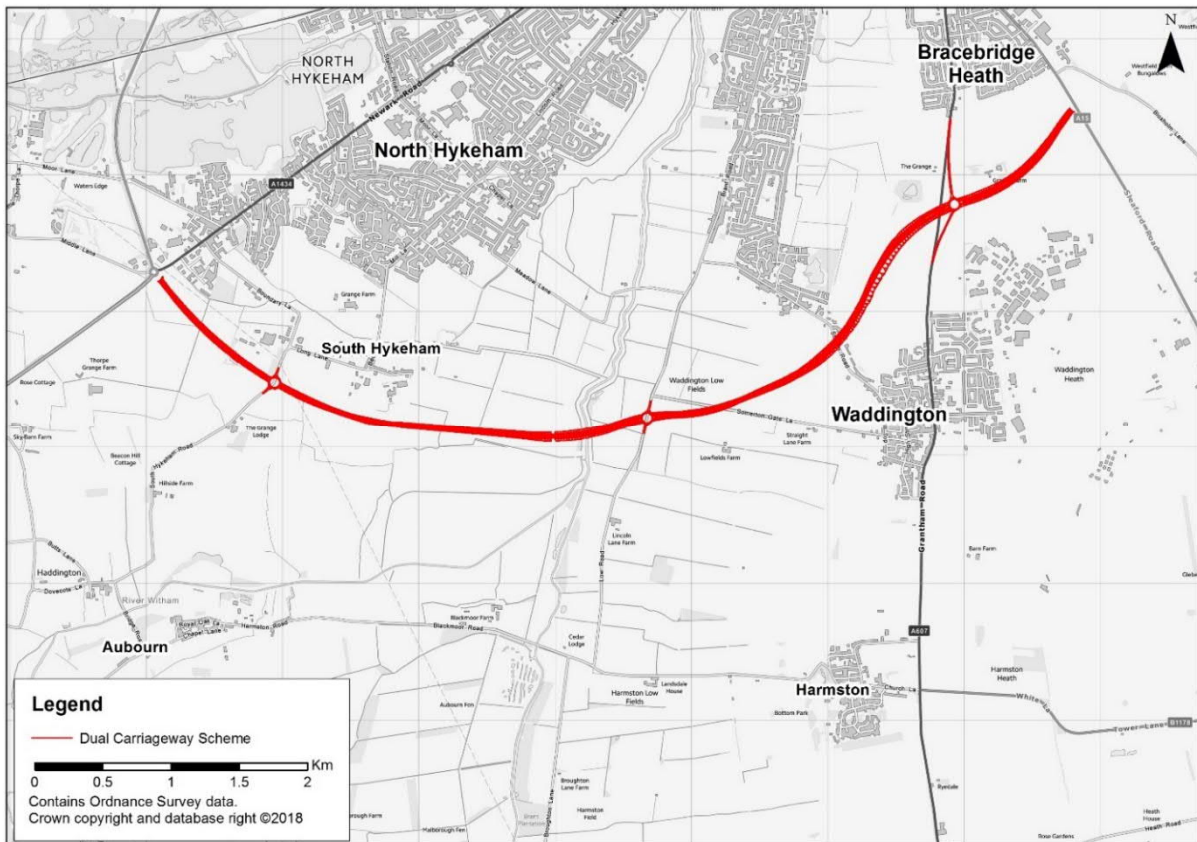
Alignment of Proposed North Hykeham Relief Road
